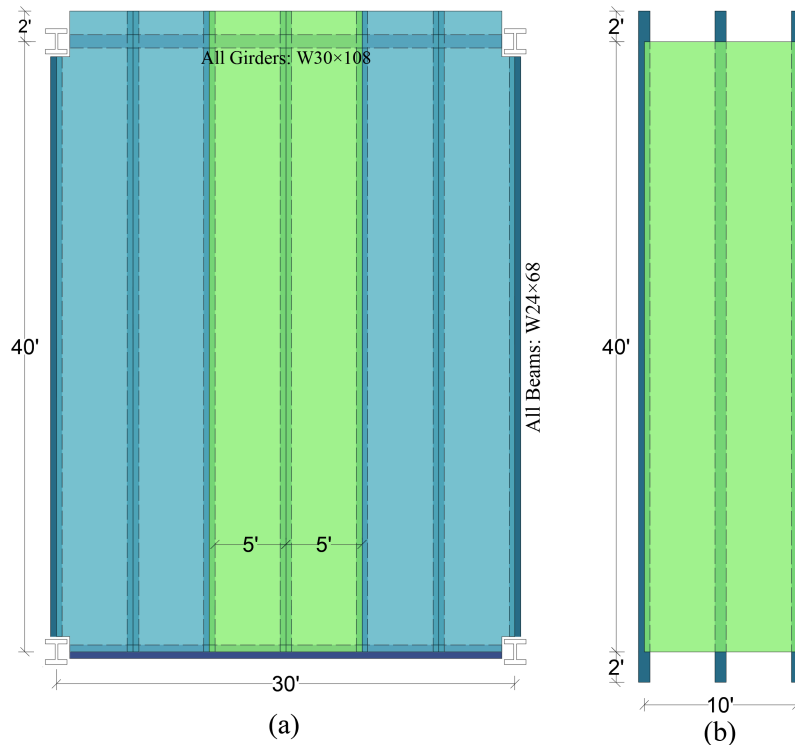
Layout of the full-bay and single FastFloor modules. (a) A 30 ft $\times$ 40 ft full-bay FastFloor module. (b) The 10 ft $\times$ 40 ft single FastFloor module tested in the laboratory.
